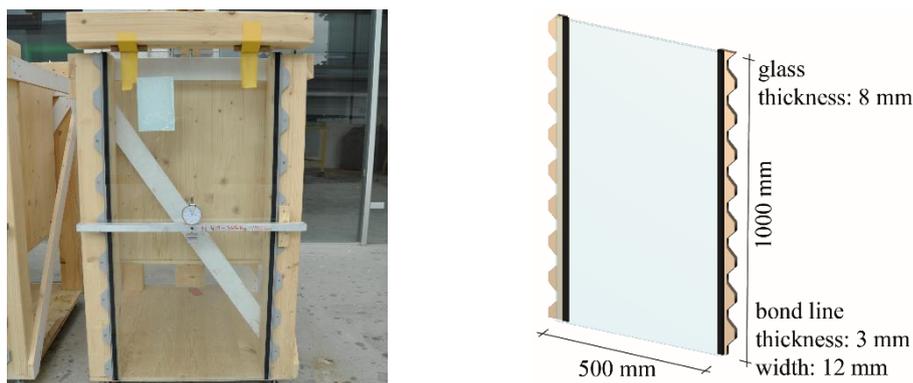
left: test setup; right: dimensions of medium-sized specimen [10]
